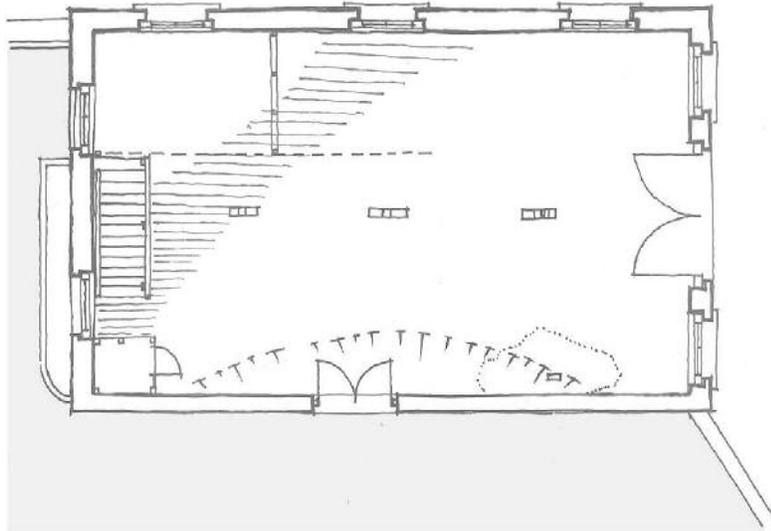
Sketch plan of first floor. NBRSPartners (WDW), June 2008. Not to scale. North at top of page.
